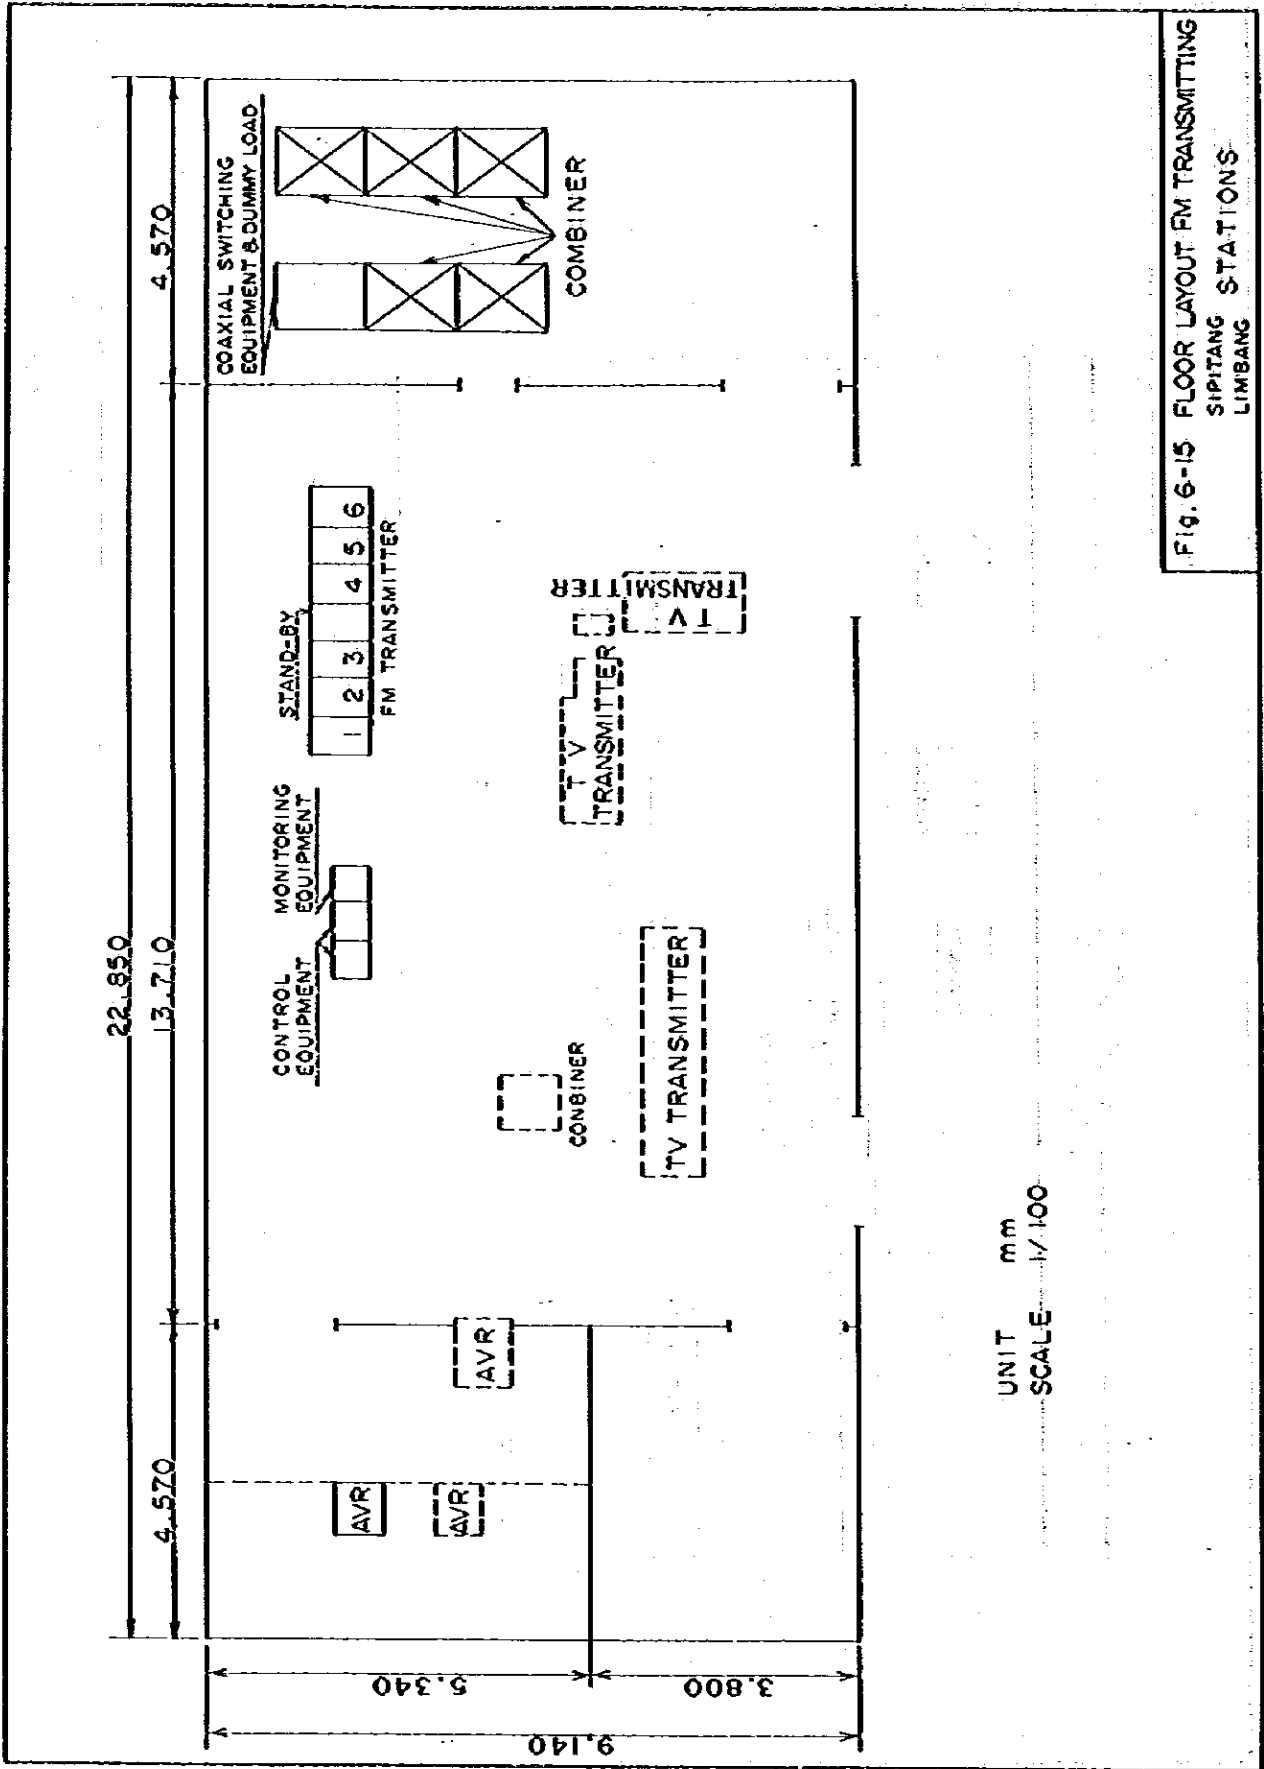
FLOOR LAYOUT FM TRANSMITTING STATIONS SIPITANG LIMBANG
